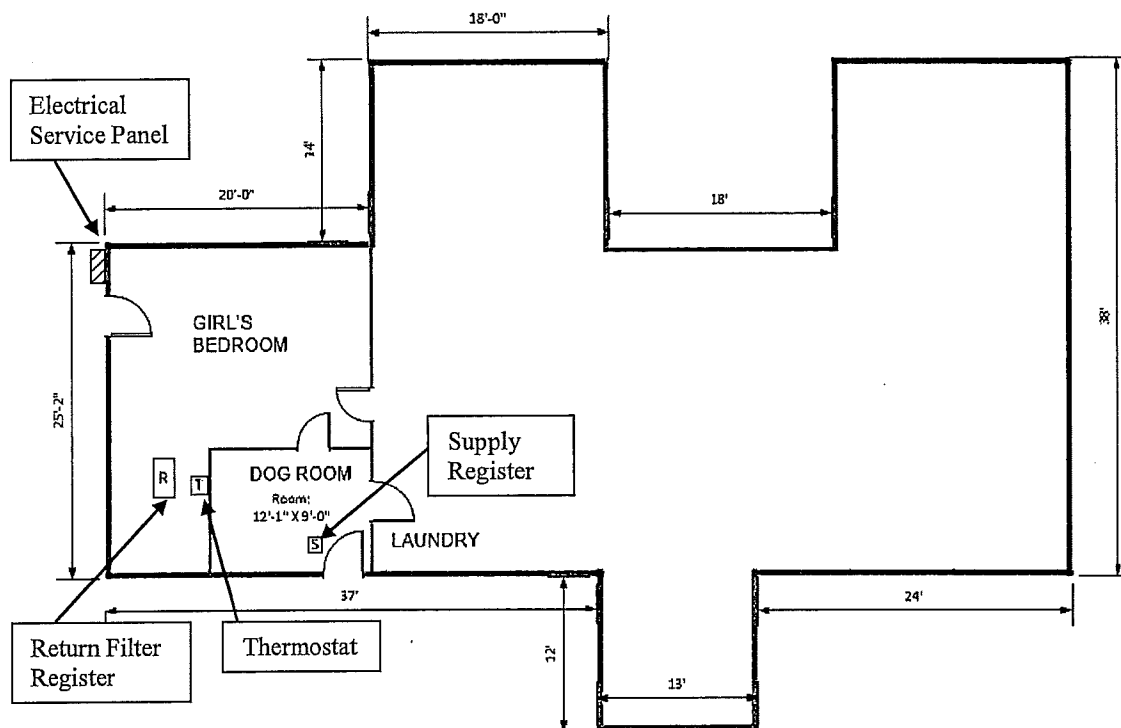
Plan view of house with dimensions for exterior and interior areas of interest. Not to scale.
